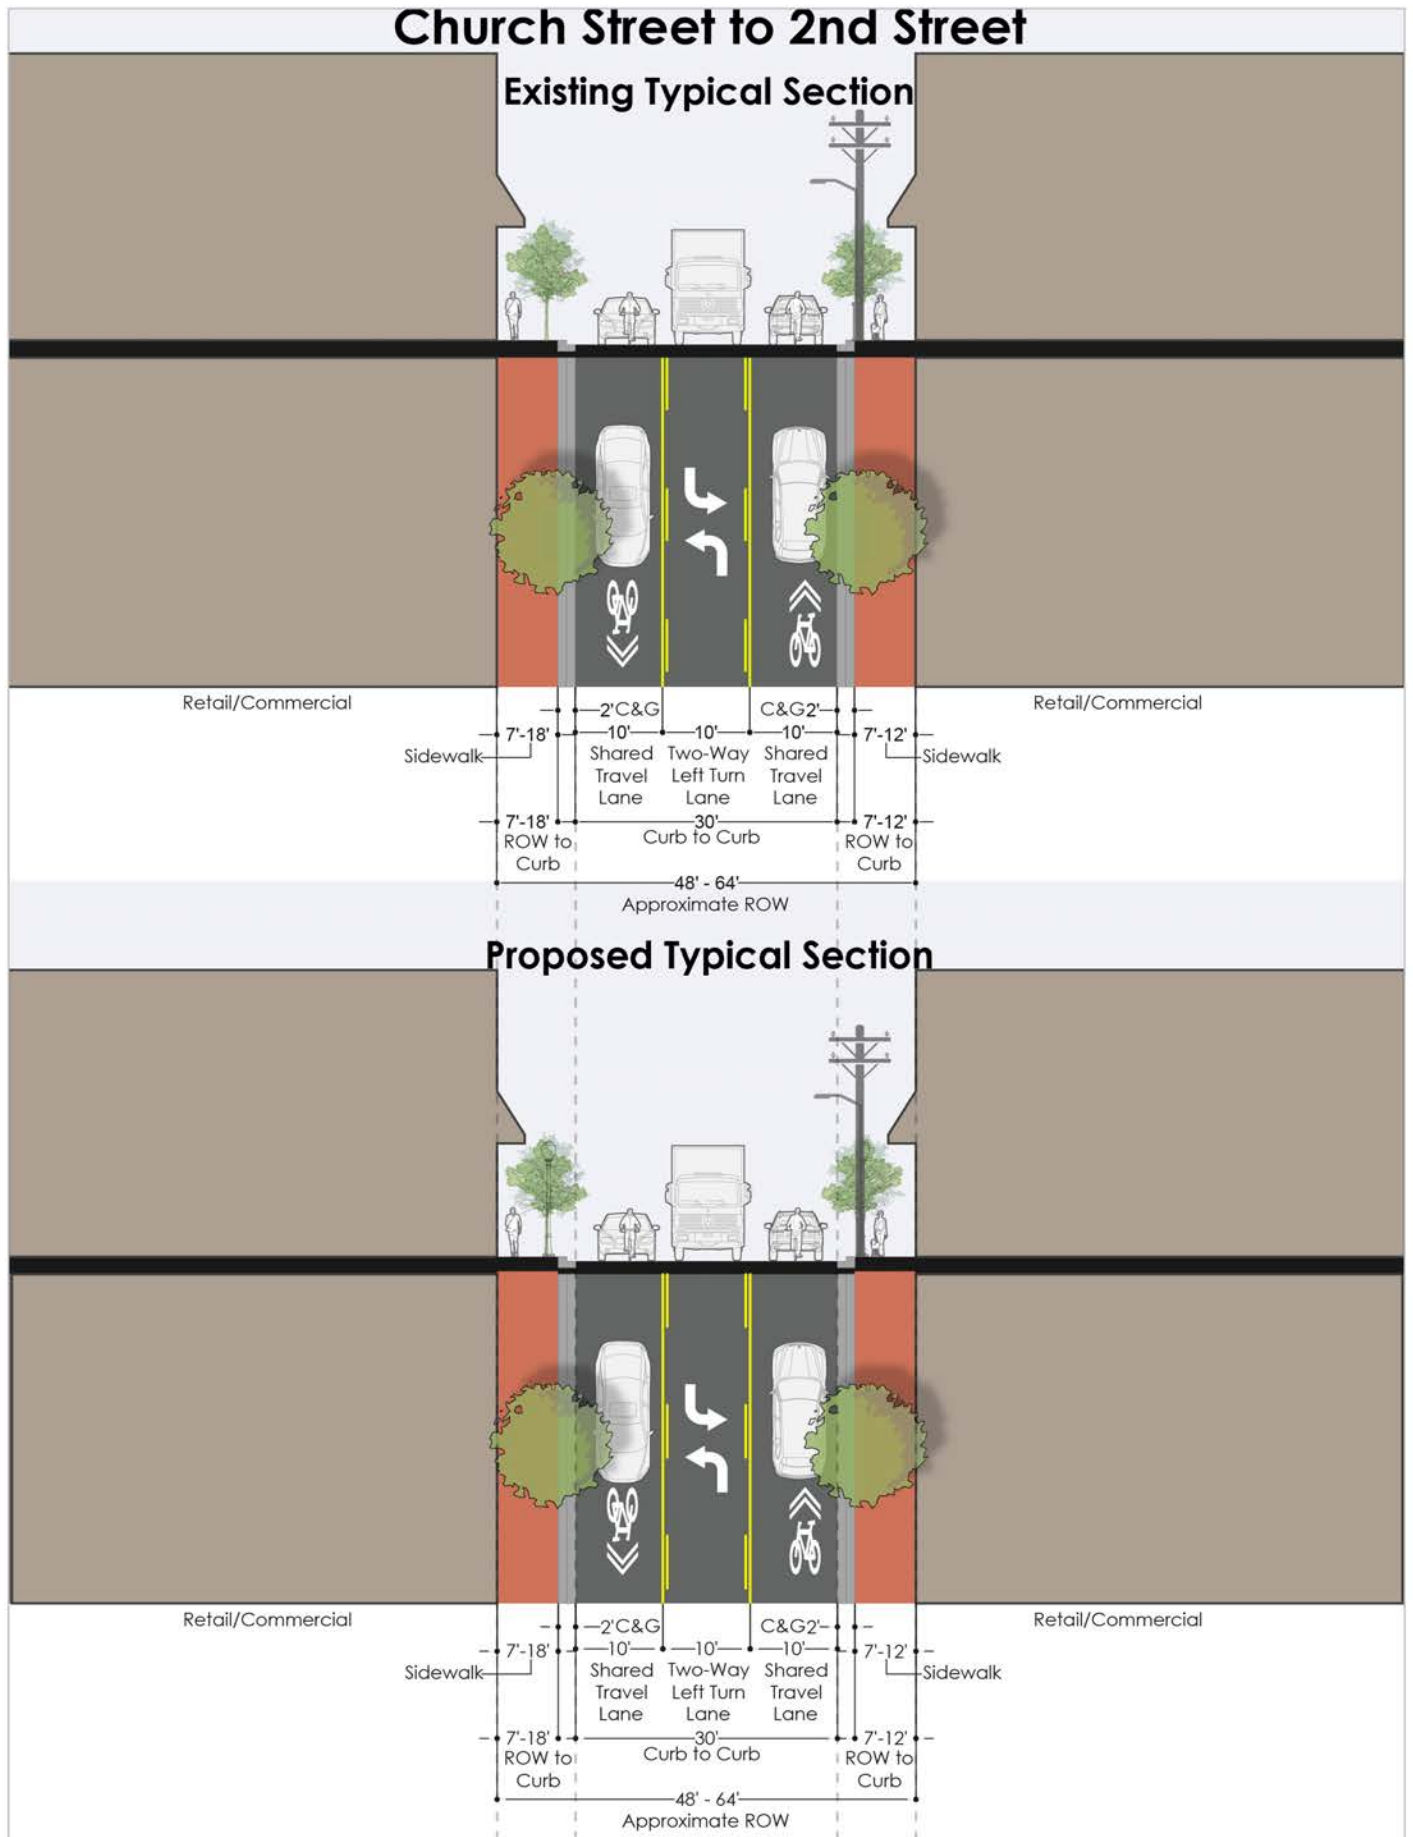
Existing and Proposed Typical Section - Church Street to 2nd Street (No Change)
